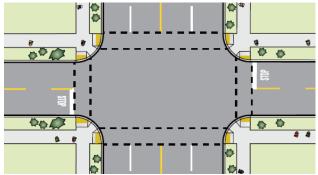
Unmarked crosswalk location where curb ramps connect
